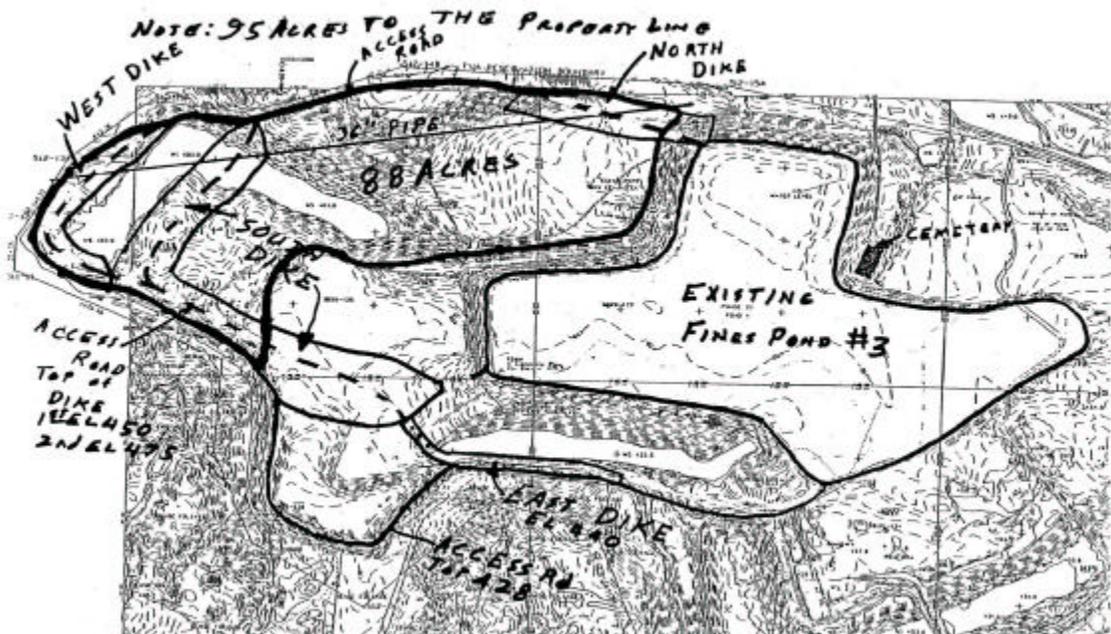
Paradise Fossil Plant Fines Pond Expansion Design
